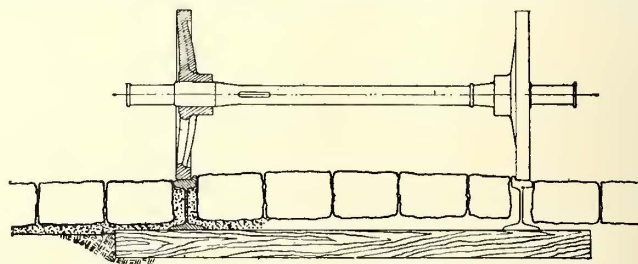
Cross-Section of Street, Showing Proposed Track and Wheels
